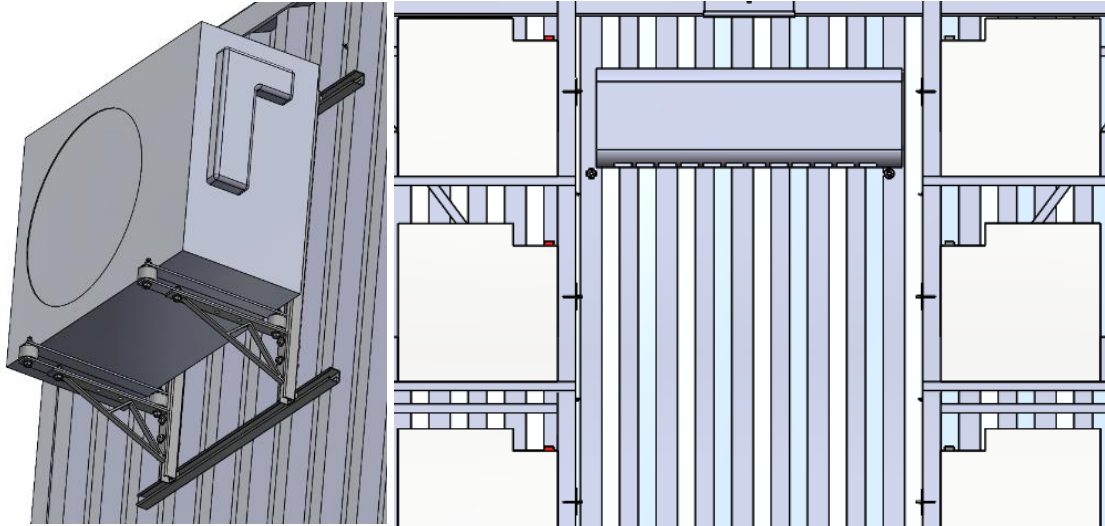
Outside unit (left) and inside unit (right) installed onto container.
